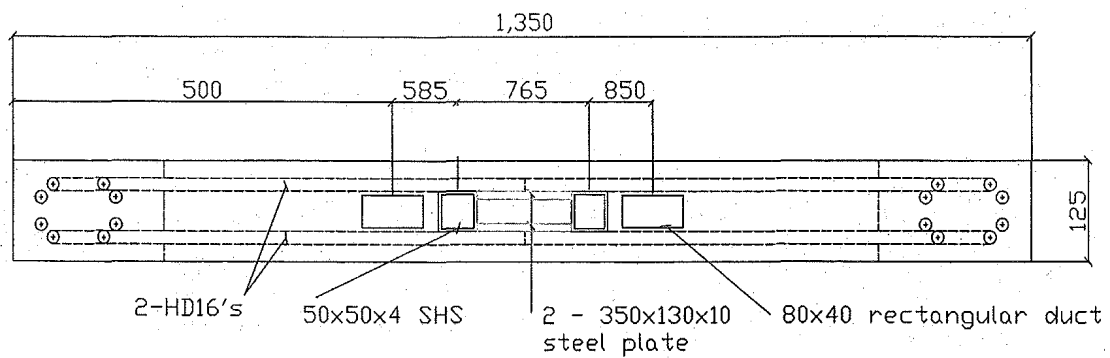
Cross-section showing diagonal and longitudinal reinforcing layout.
